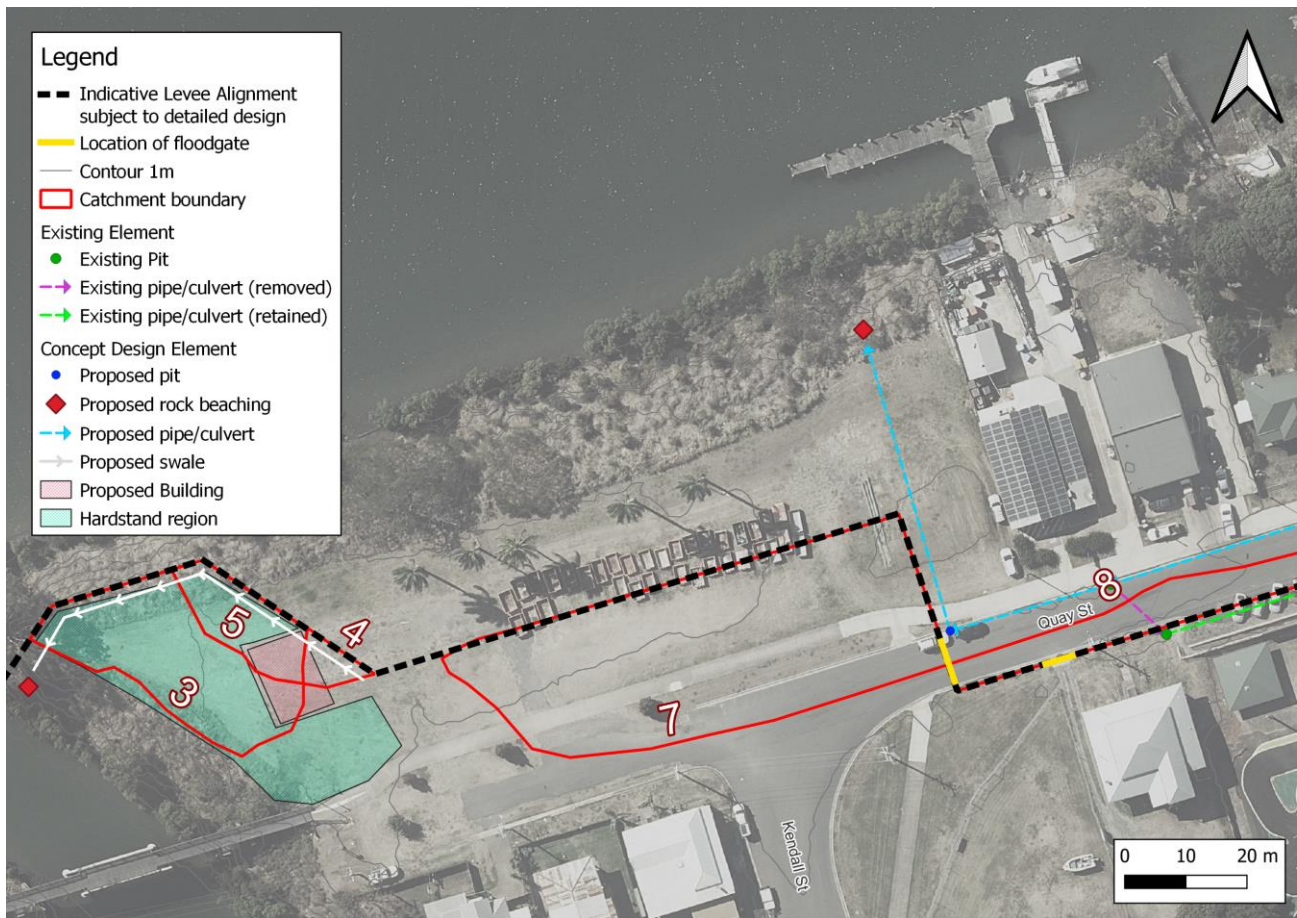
Catchments 2-7 Concept Drainage Design Layout.
